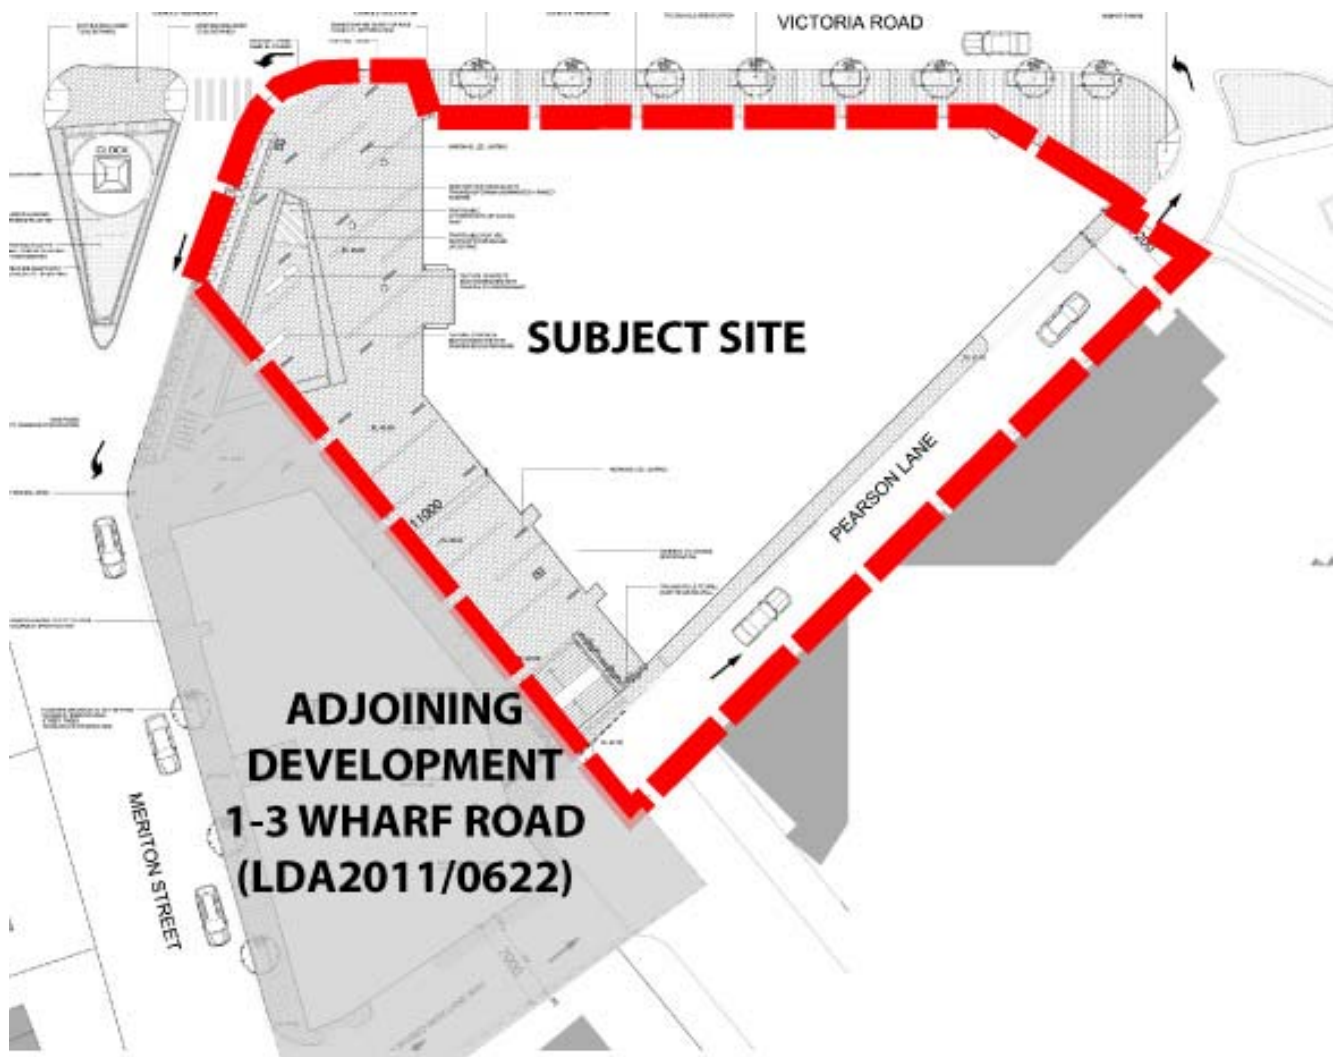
The site and the adjoining development site 1-3 Wharf Road
